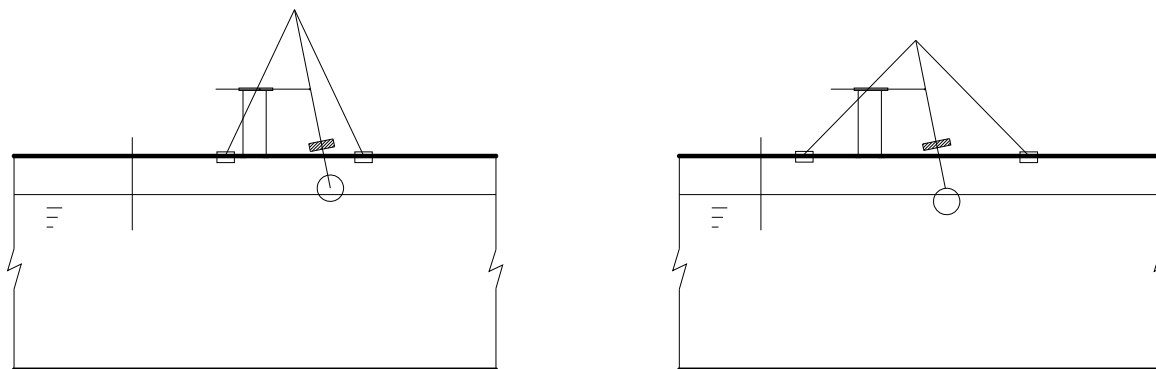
Adjusting pivot height by sliding fixers of triangle tower
